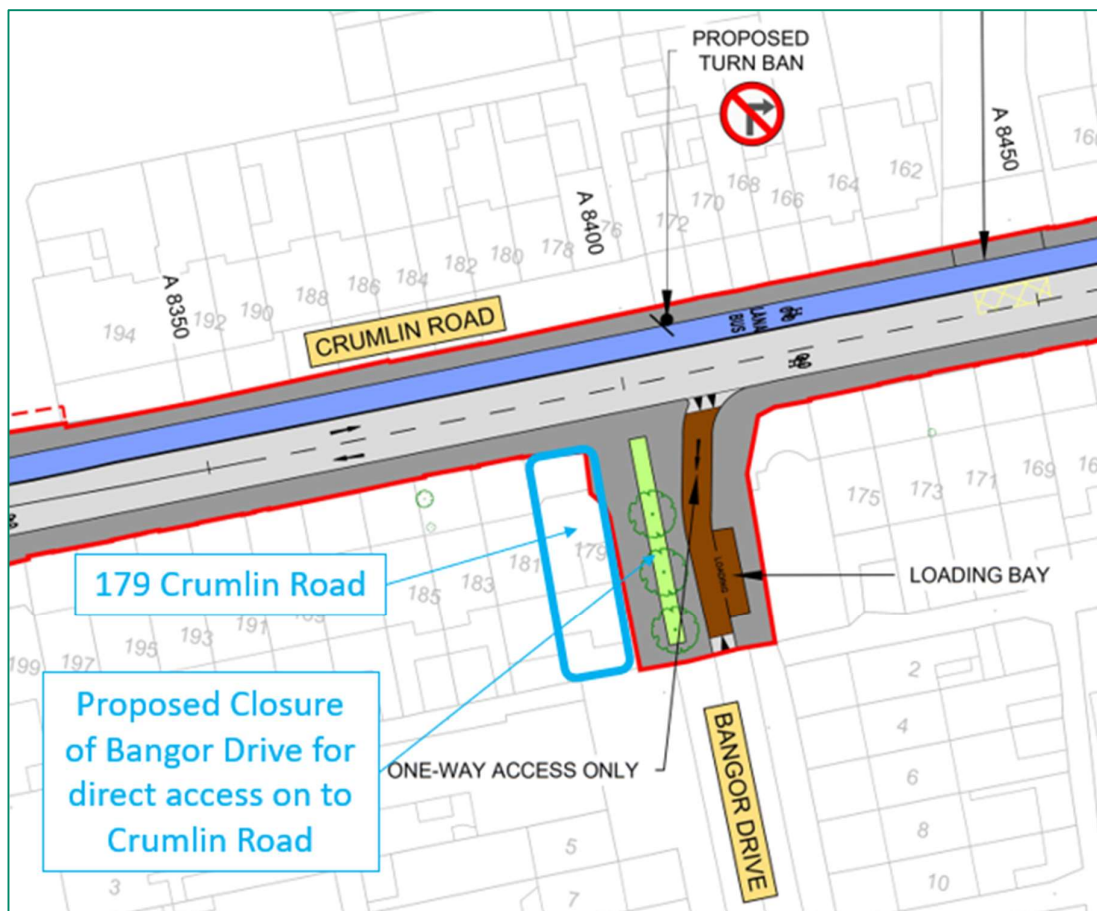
General Arrangement of Proposed Scheme adjacent to 179 Crumlin Road (Sheet 26)
